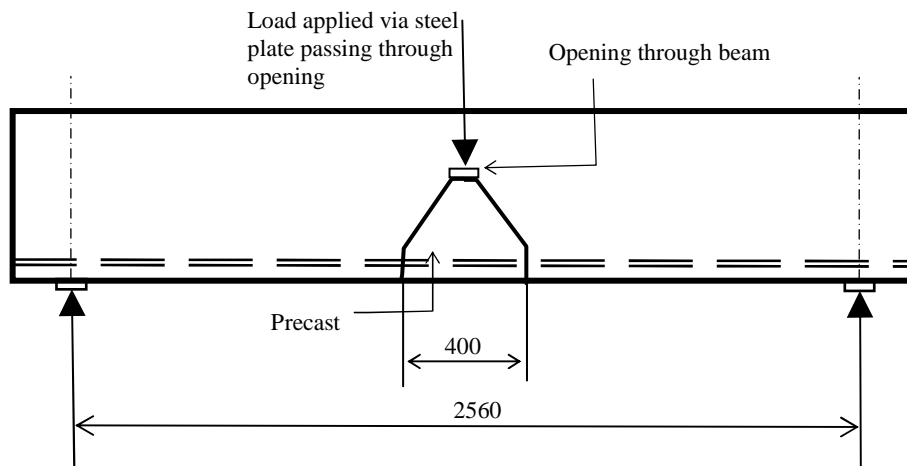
Beam arrangement with load applied via steel plate passing through opening
